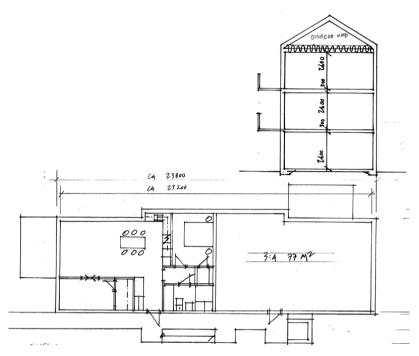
Architectural sketch for plan cross-section "long" including elevation sketch
